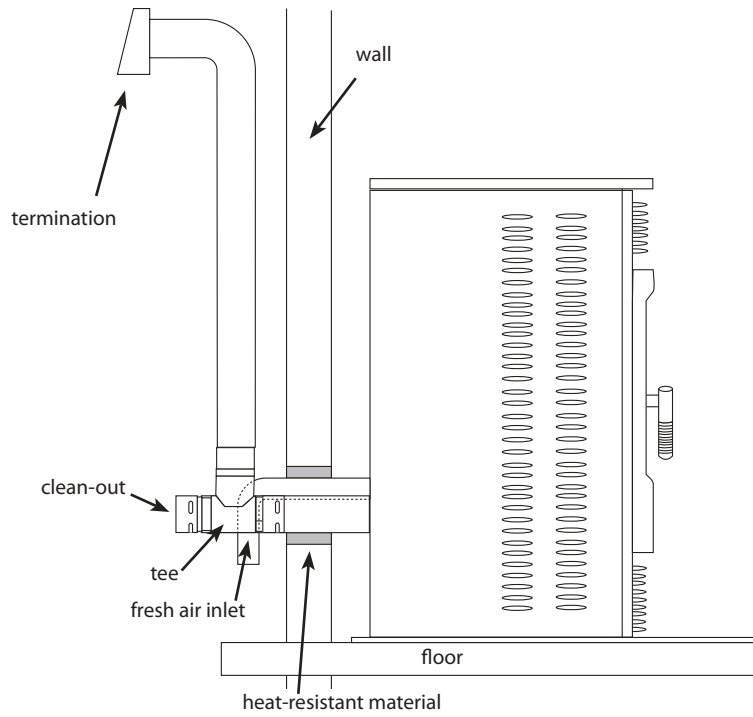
Straight Installation—Outside Vertical Rise, Horizontal Termination
